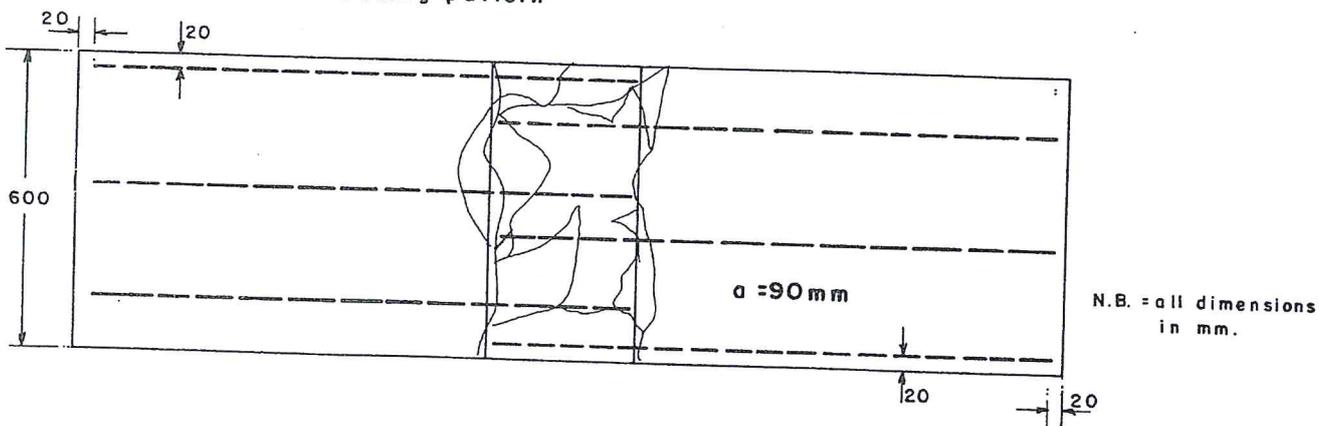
Typical cracking pattern of slabs with large splice-bar spacing [Slab S4-14-300-90 (1 in. = 25.4 mm)]
